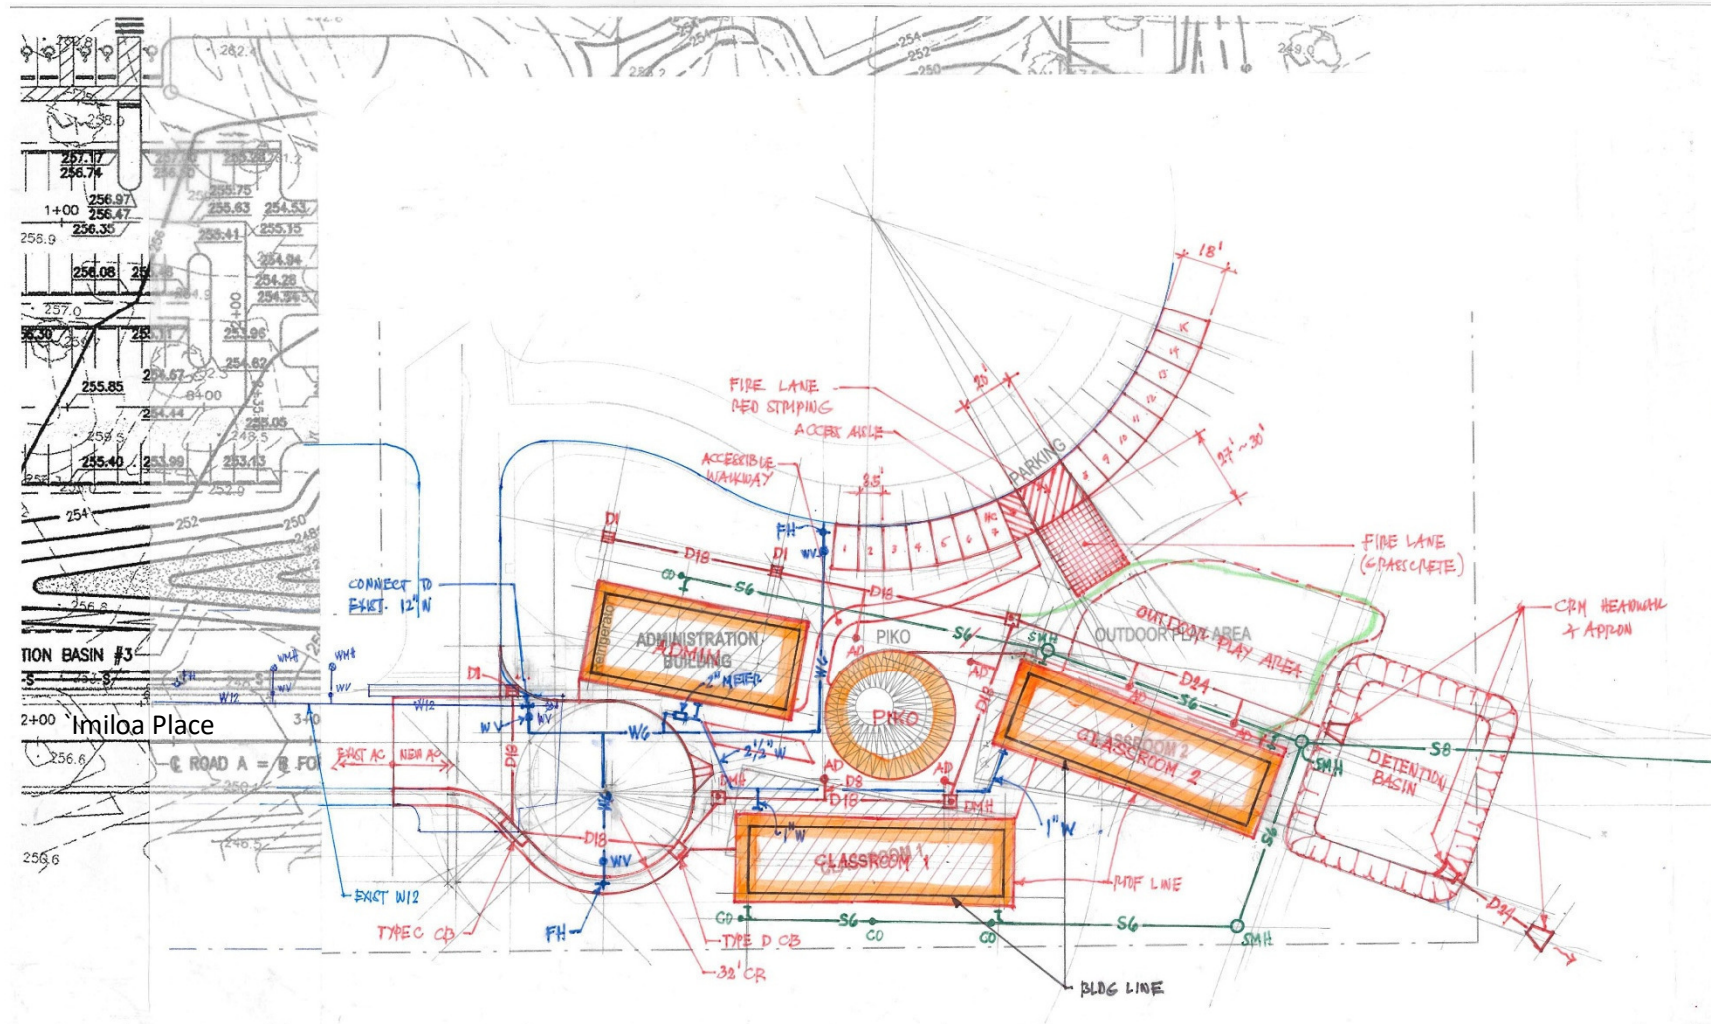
Proposed `Imiloa Pre-Kindergarten School Site Plan
